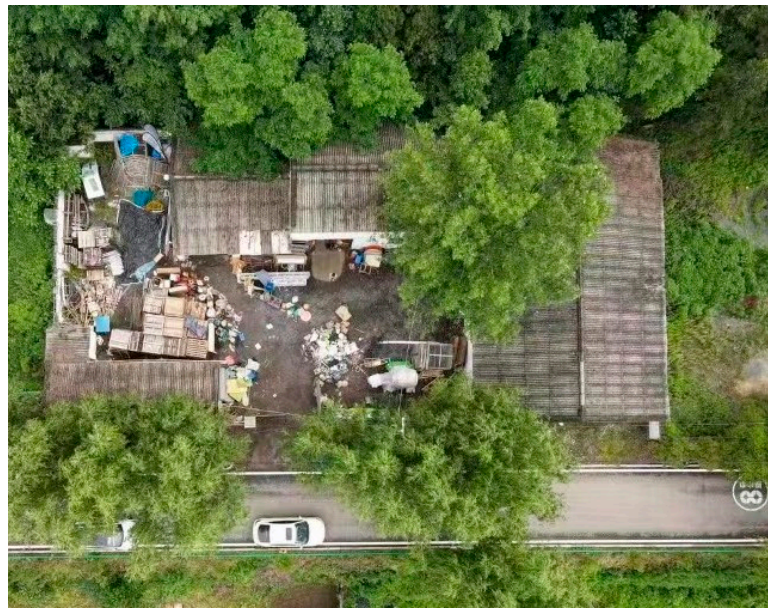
The floor plan before renovation. Source: The VCC of X village, 2018.
